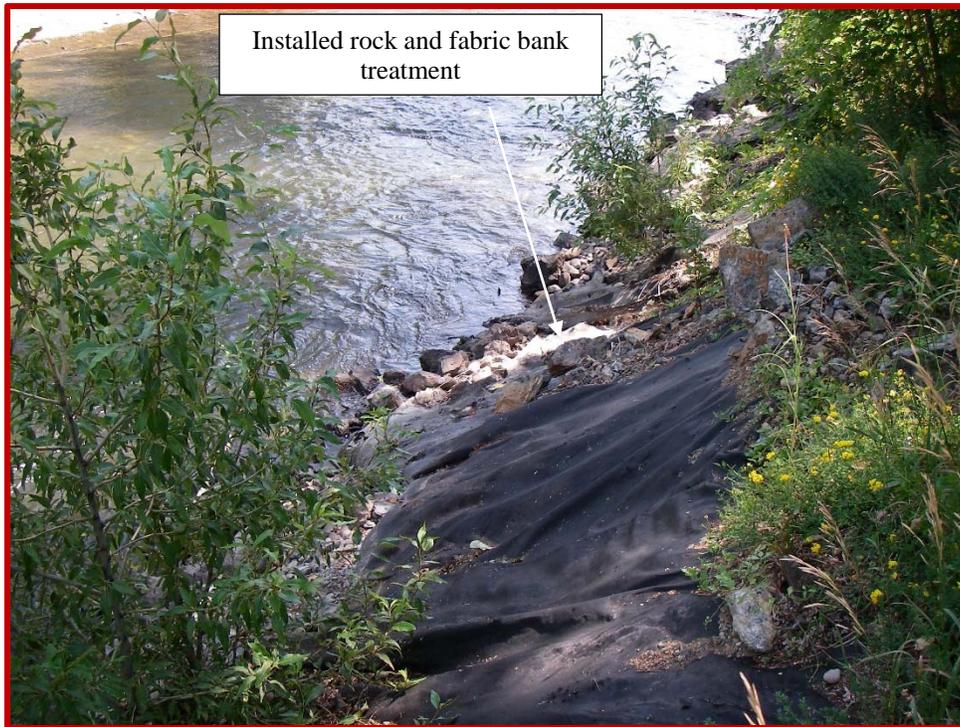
Photograph of installed bank stabilization treatment in the Broadford Street Bridge Reach.
